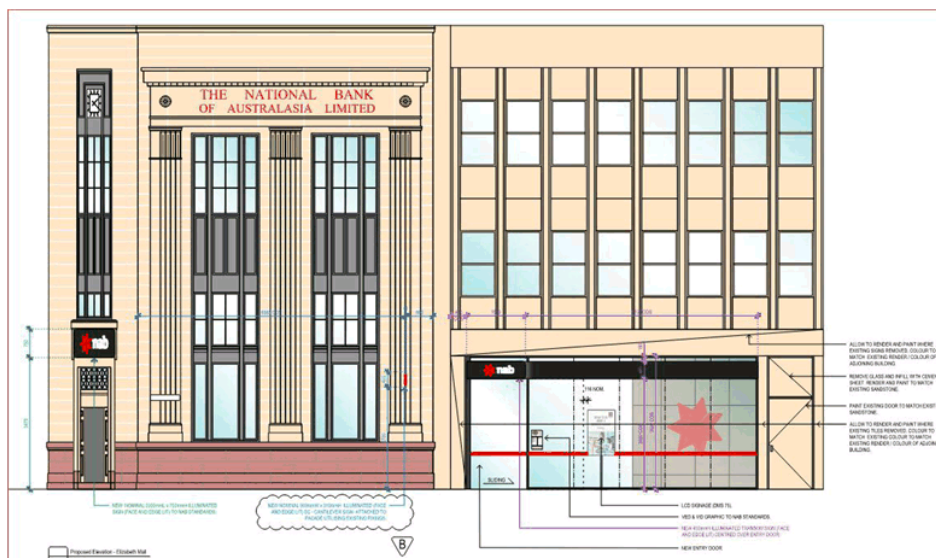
proposed signage on the Elizabeth Street Mall elevation and above the entry doors on the corner of Liverpool St and the Elizabeth Street Mall
